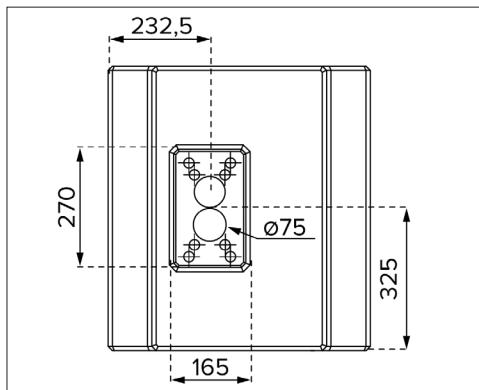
Dimensions of prefabricated foundation [mm] - Top view
